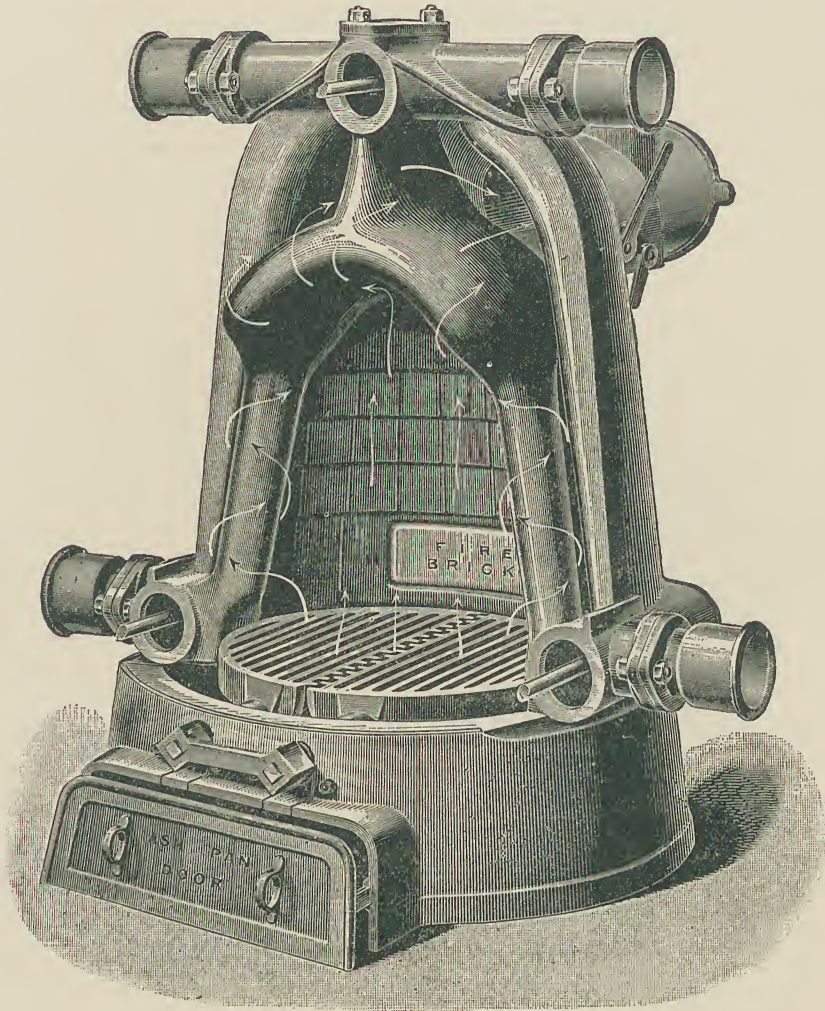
View of "Viaduct" Cast-iron Boiler, with the Front Half of the Outer Case Removed.
